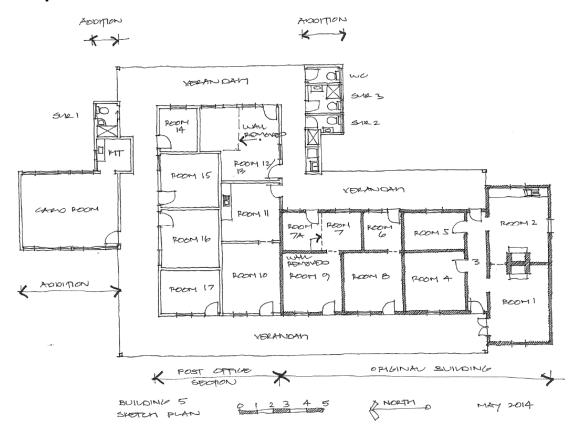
Sketch plan of Building CM1. (Source: David Hobbes of Philip Leeson Architects, May 2014)
